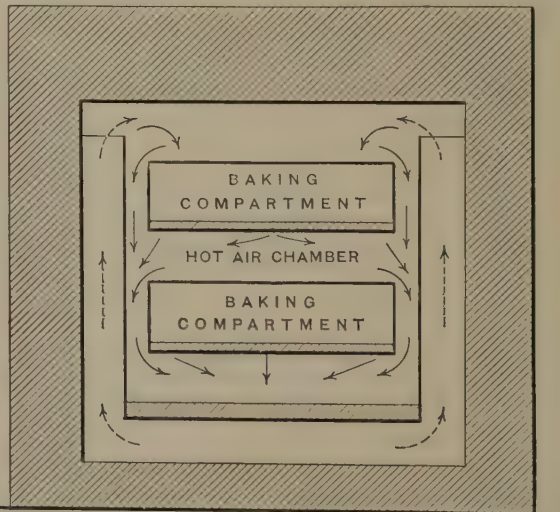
Cox's Heat Trap Oven: Plan A A (see fig. 204)
